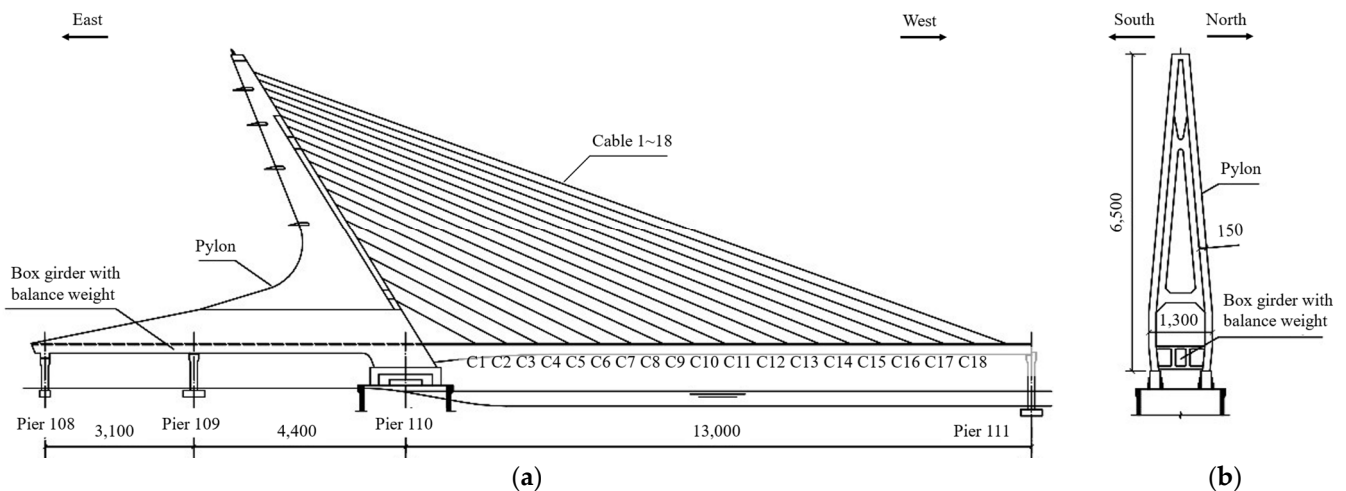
Layout of the bridge (units: cm): (a) elevation; (b) pylon section.
